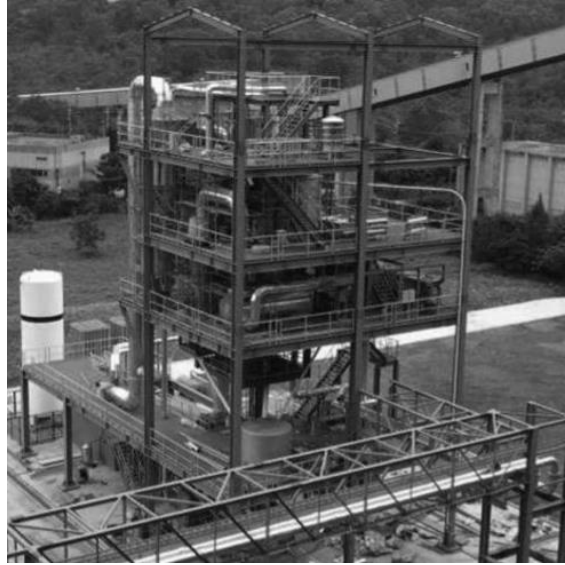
Construction of 1.9 MW_{th} CaL plant [67]
